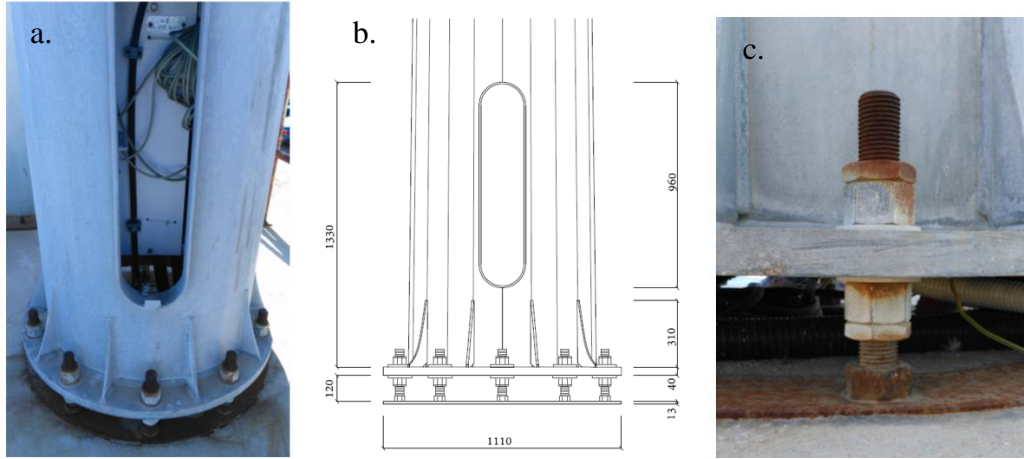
Base details with inspection opening (a, b) and bolted connection (c).
